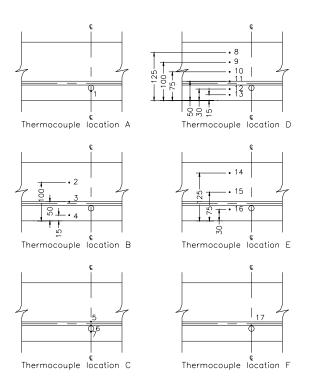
Thermocouple location for a typical test slab (refer to Table 1)
